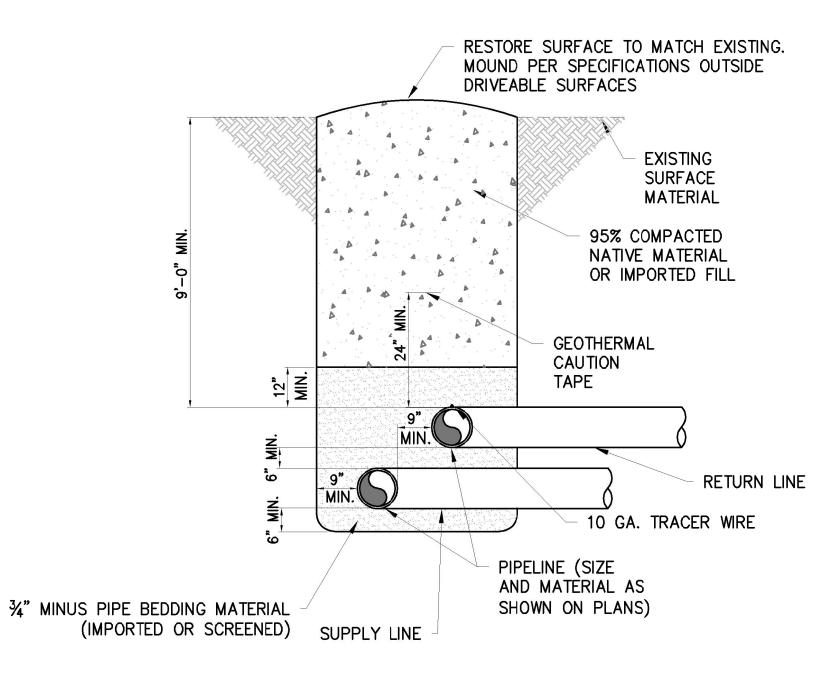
DETAIL - ROAD SHOULDER/ CROSS FIELD TRENCH TYP NO SCALE
